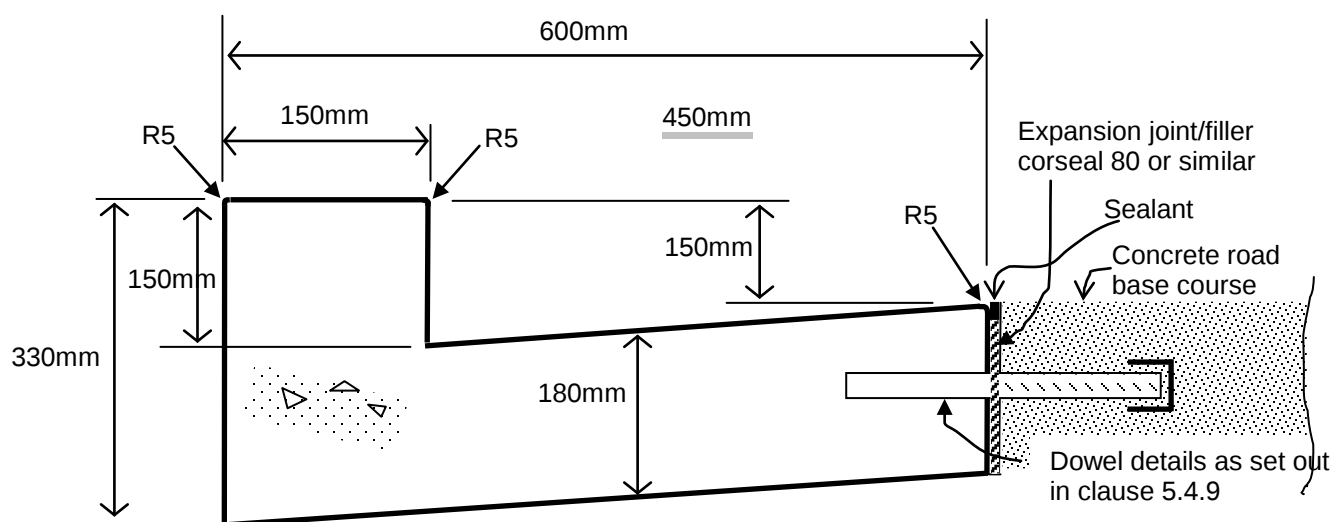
Cross section of a typical construction of square-form kerb and gutter style (reinforcing mesh not shown)
